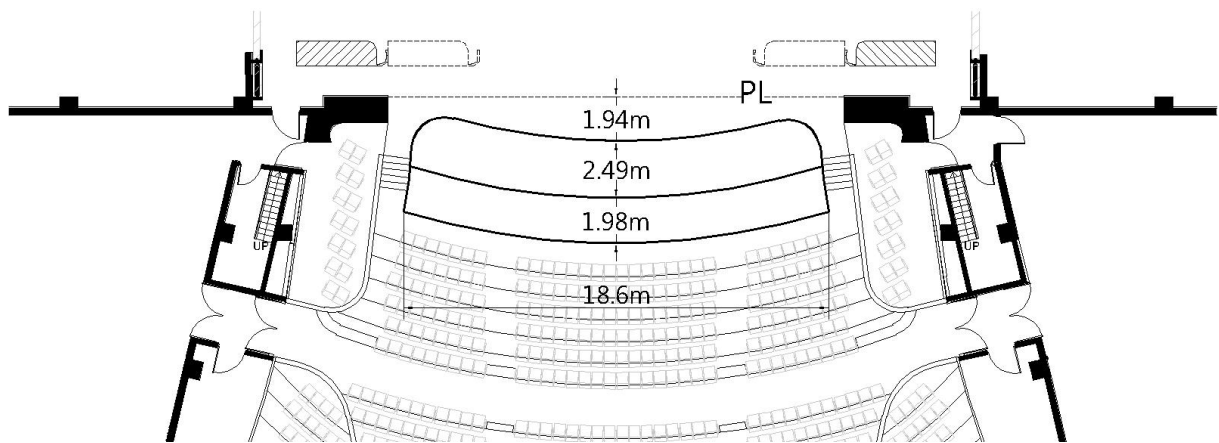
Orchestra Pit Elevation Platform location plan
